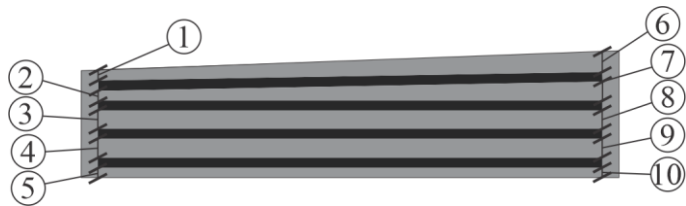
Illustration of bearing pad dissection measurement (pad type F)
